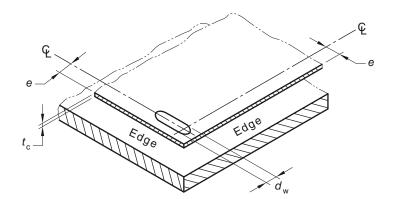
EDGE DISTANCE FOR ARC SEAM WELD
